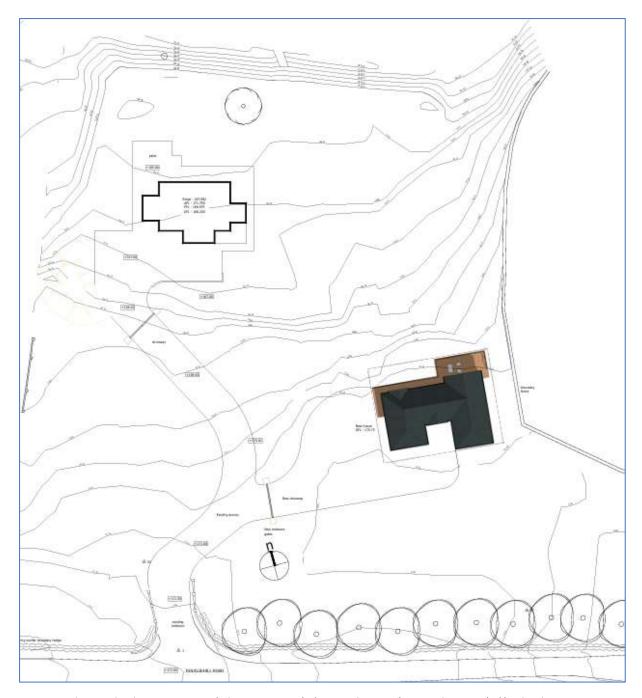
Indicative development proposal plan. Source: Nicholson McShane Architects. Plan Provided by the client.
